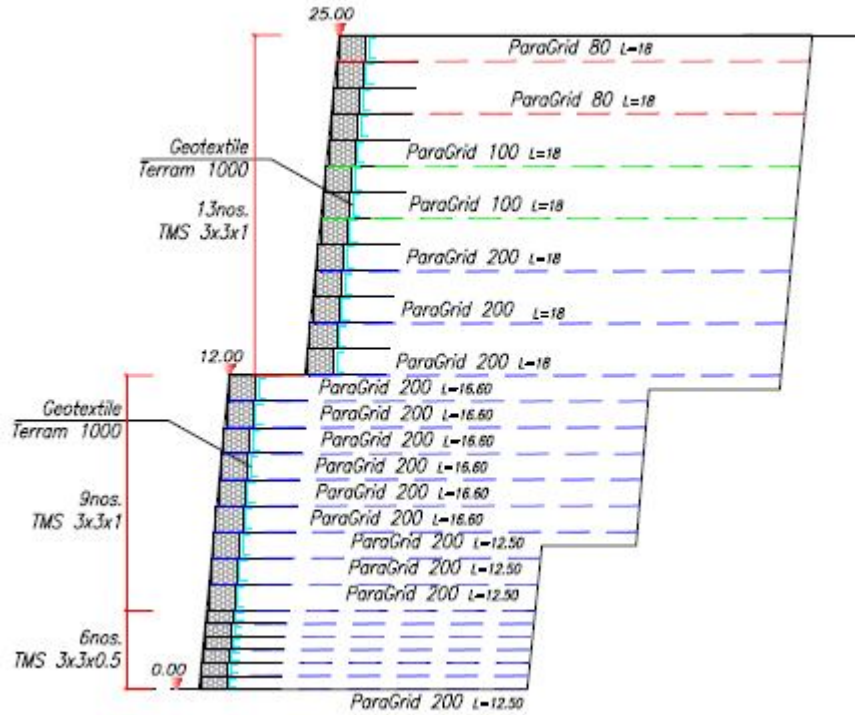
Tallest cross section (H25.0m) of the MSE wall system
